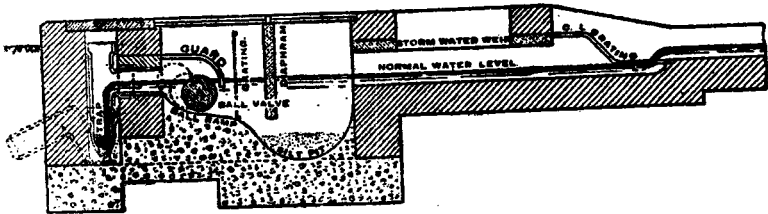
"MADRAS" PATENT STORM WATER SEPARATOR showing application to connection of side drain to sewer—(Madeley).
